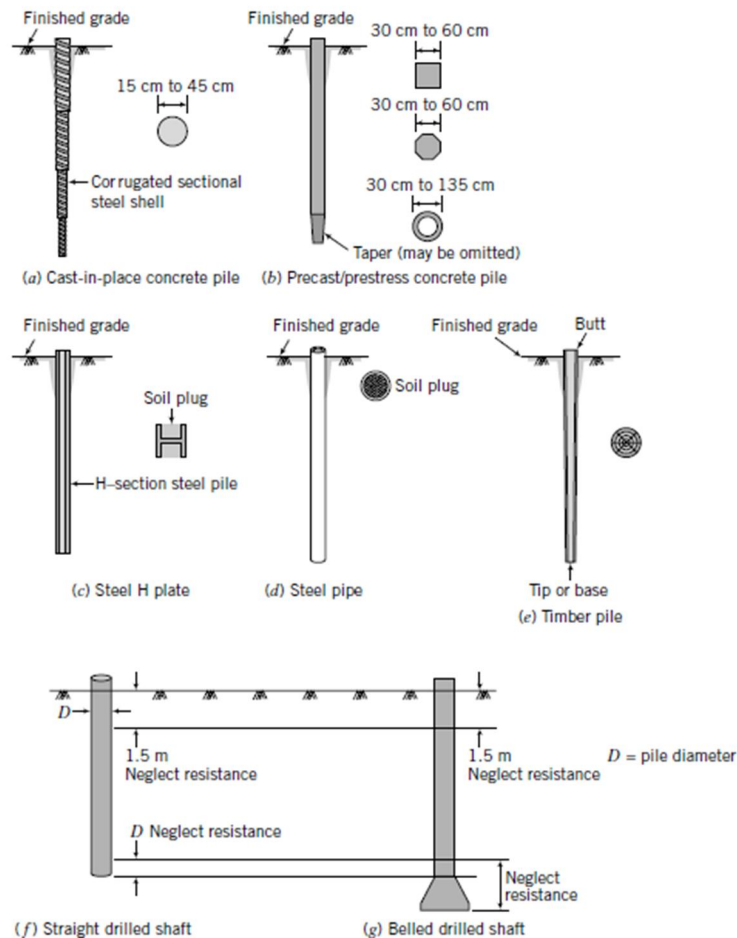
Sectional elevation and cross-sectional detail of pile types. Adapted from *Soil Mechanics and Foundations* (p. 511), M. Budhu, 2011, John Wiley and Sons Inc.
